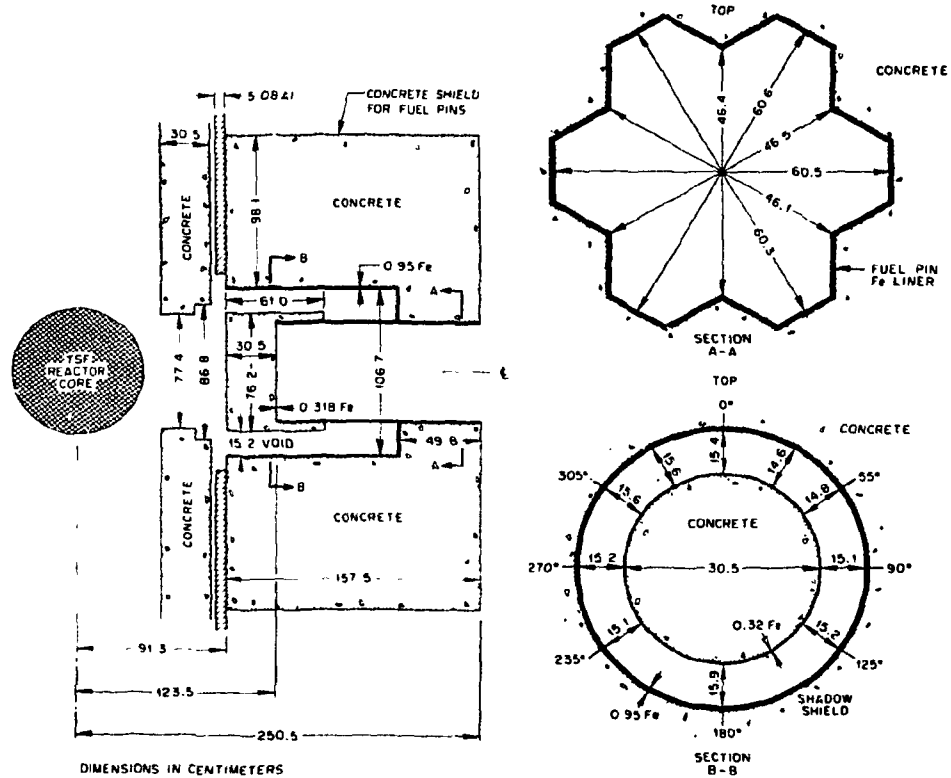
The initial mockup of concrete shadow shield and surrounding concrete.
